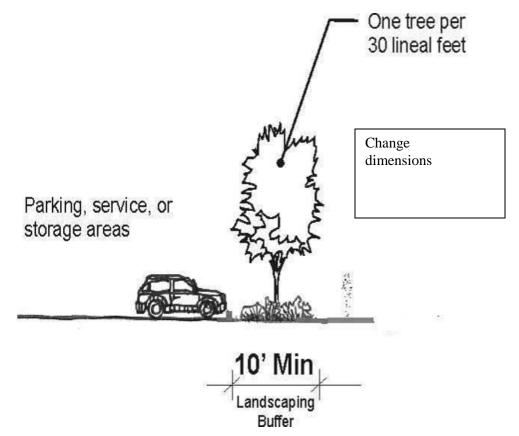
Illustration of requirements for landscaping between a street and parking lot
